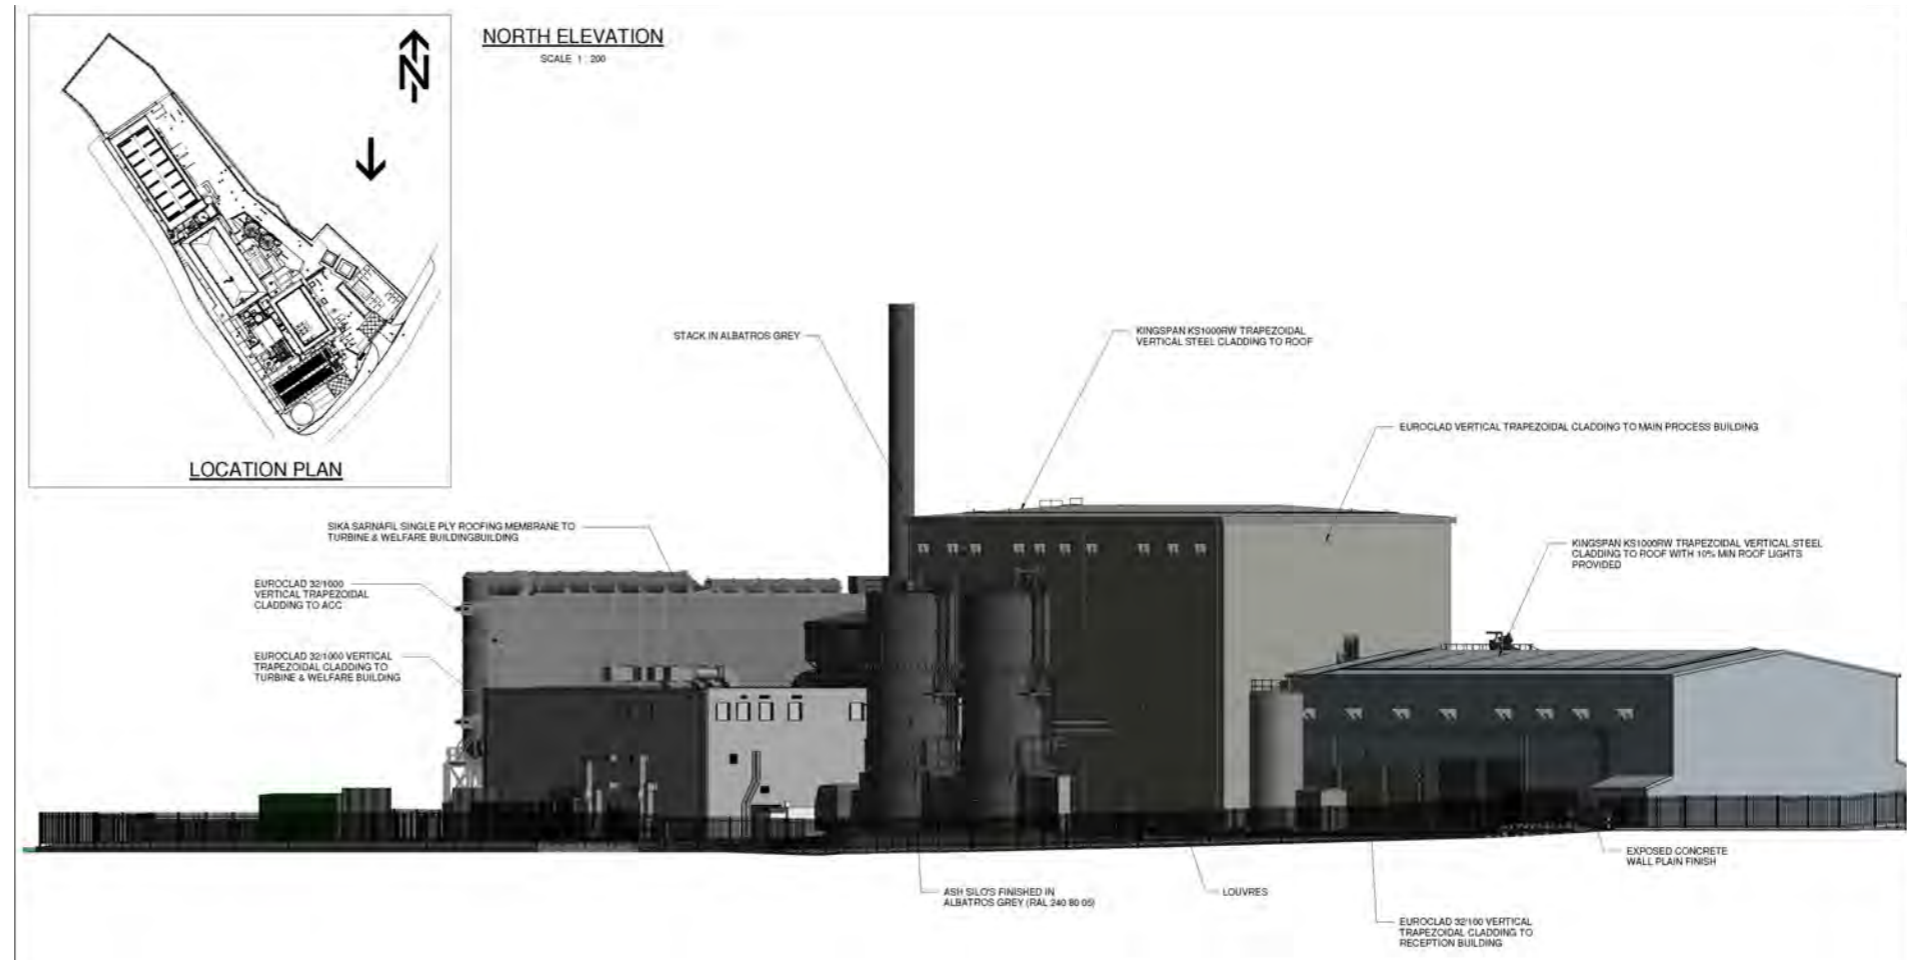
North Elevation—BARRY\_19\_DWG\_01\_40002
